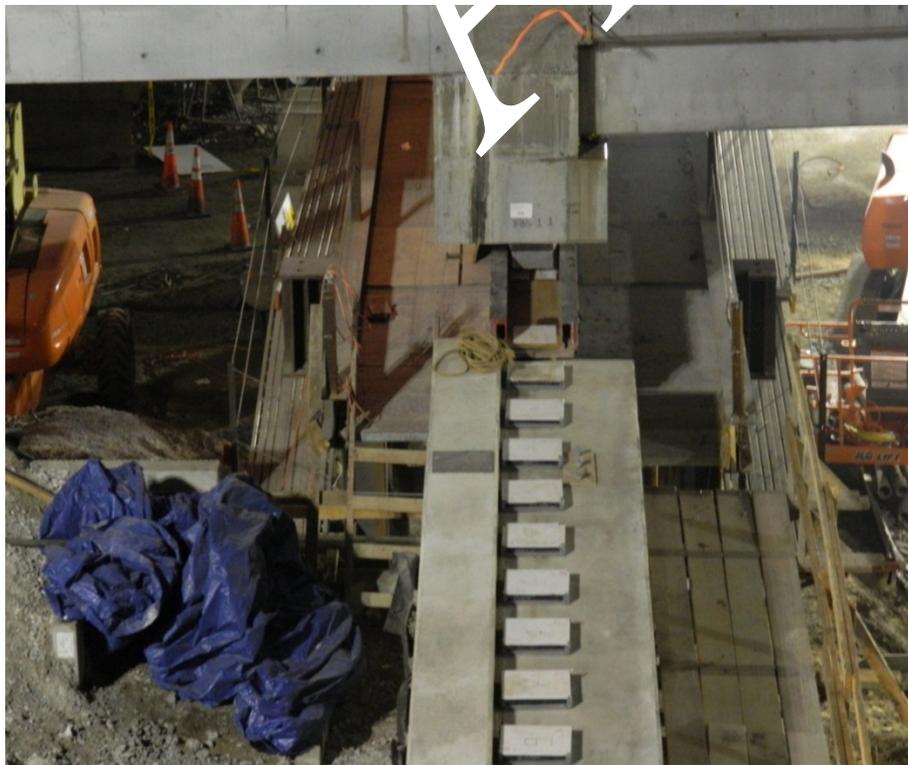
Photo. PTFE pads on sleeper slab to facilitate sliding at end of approach slab.
